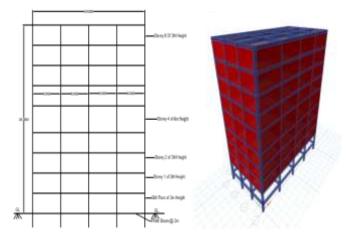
2D and 3D Elevation of Structure with Mass Irregularity at Storey 4
